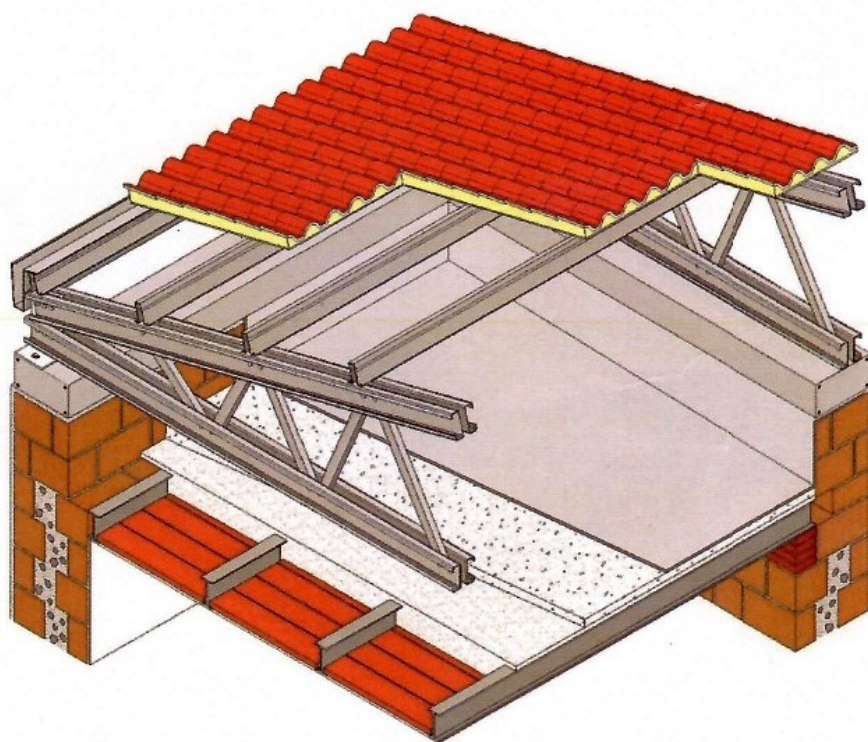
Example of application of CFS roofing on existing roof with steel beams and bricks (Zuccaro and Leone, 2012) [47]
